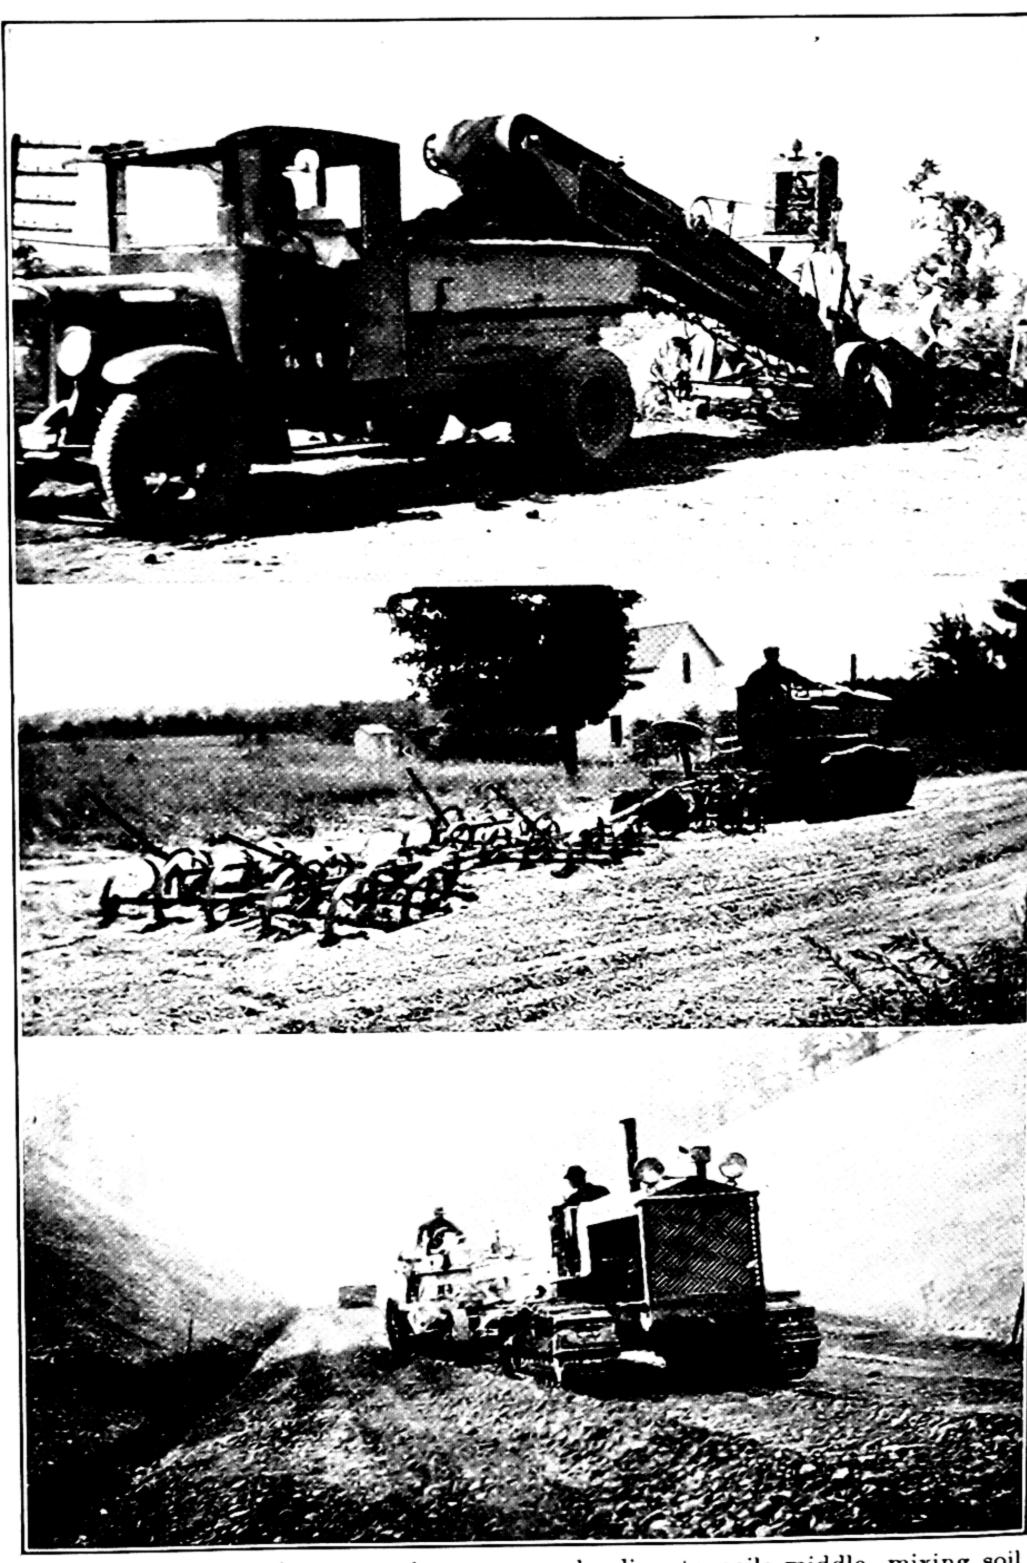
Construction operations: upper, loading topsoil; middle, mixing soil on road; lower, mixing clay and gravel with the blade grader.
